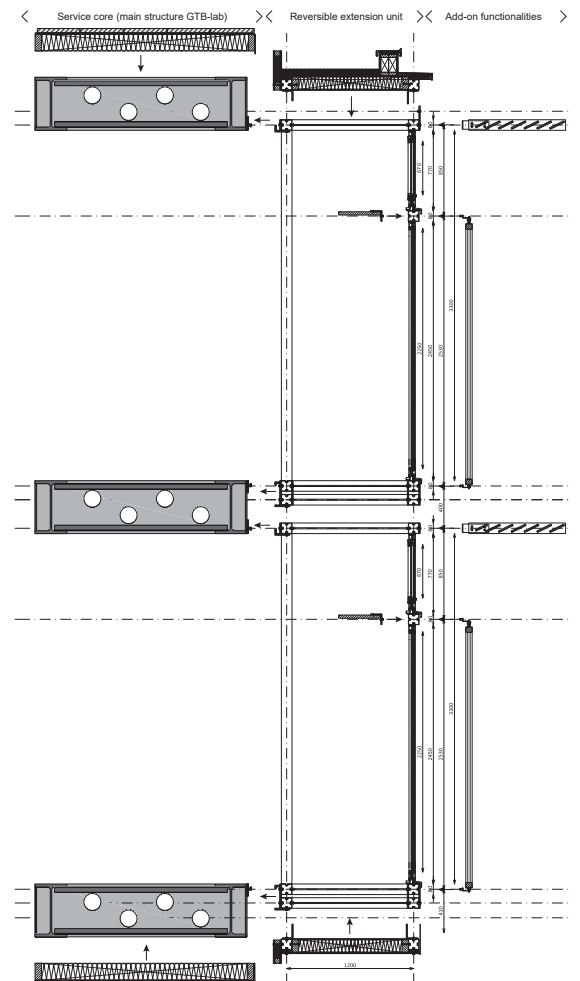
Exploded view, section reversible extension unit that will be connected to the service core of the GTB-lab.
